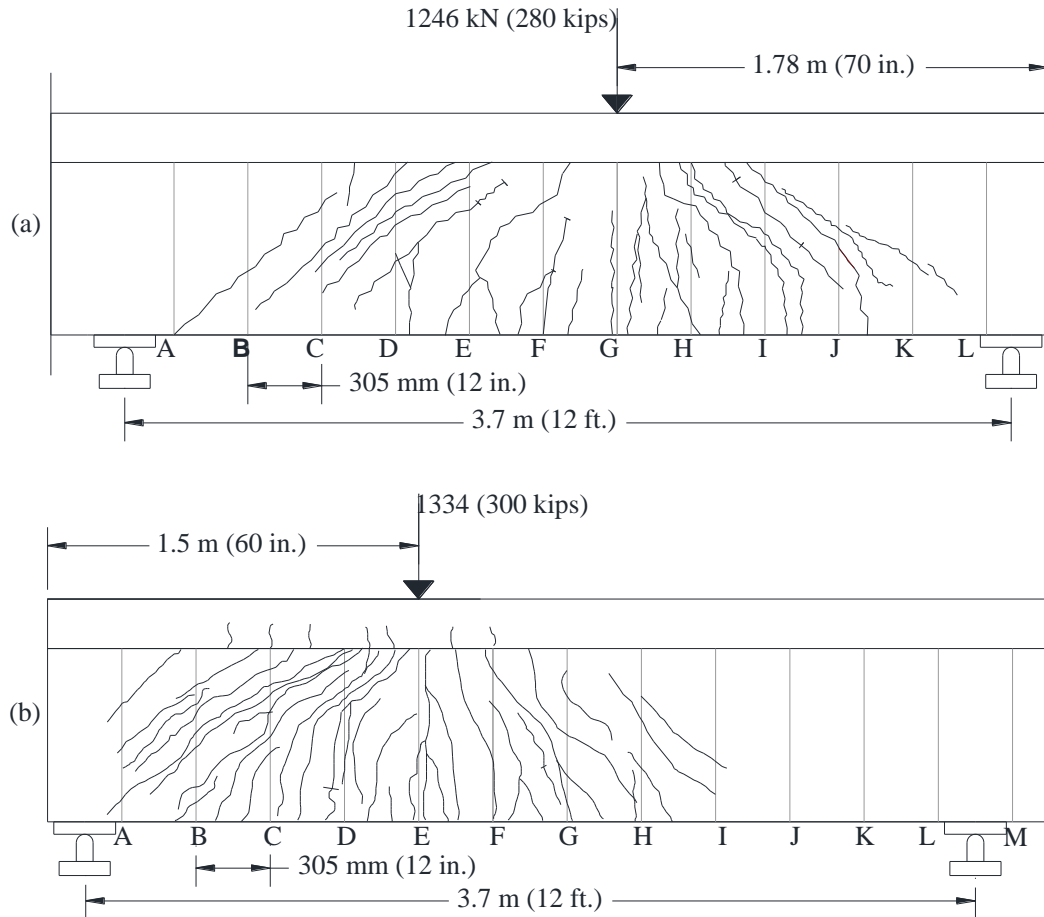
Crack Pattern under Shear Tests: (a) Shear Test 1 and (b) Shear Test 2.
